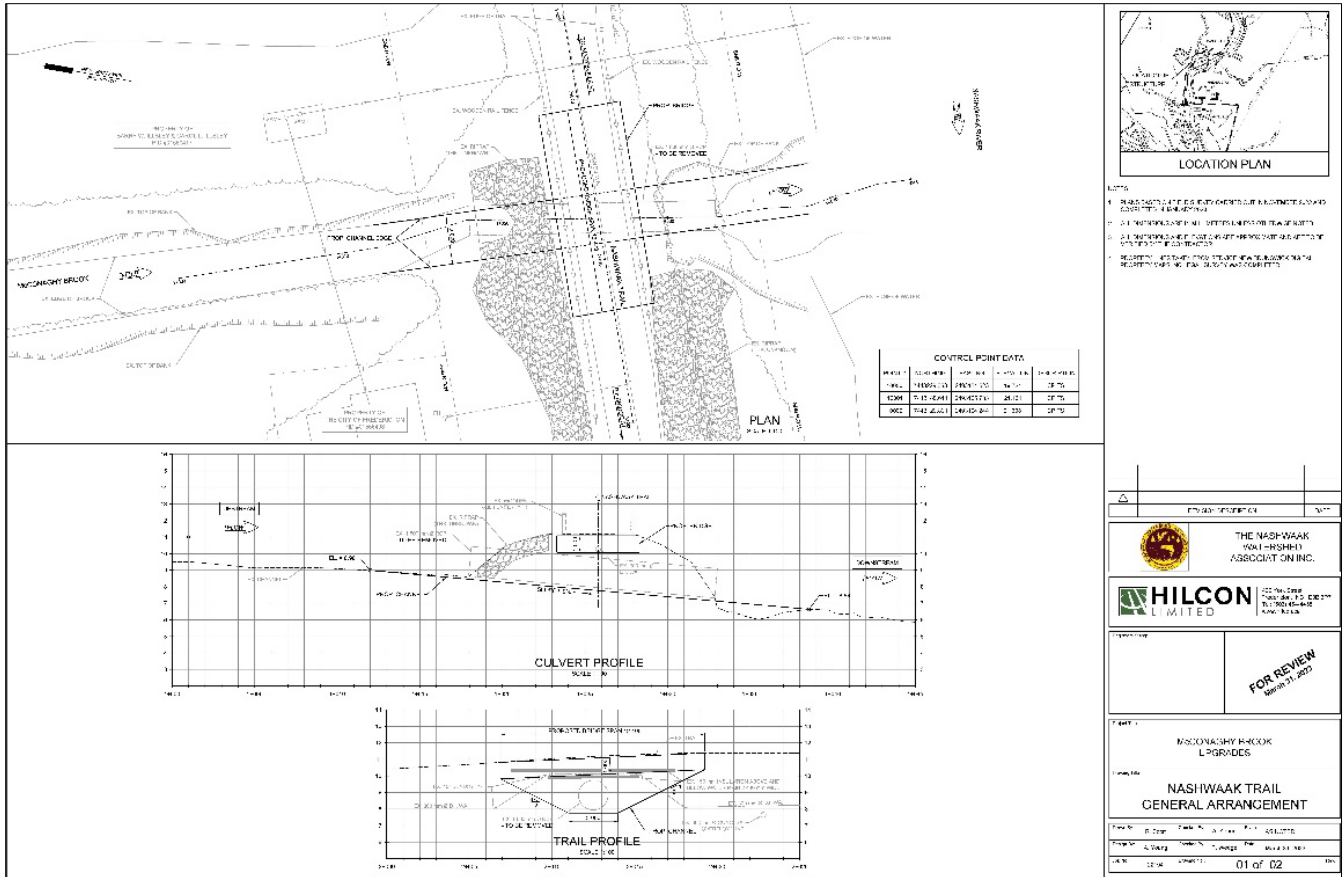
Preliminary engineering design showing the proposed bridge to replace the culvert MC02, crossing the NB trail on McConaghy Brook. Design completed by HILCON Ltd.
